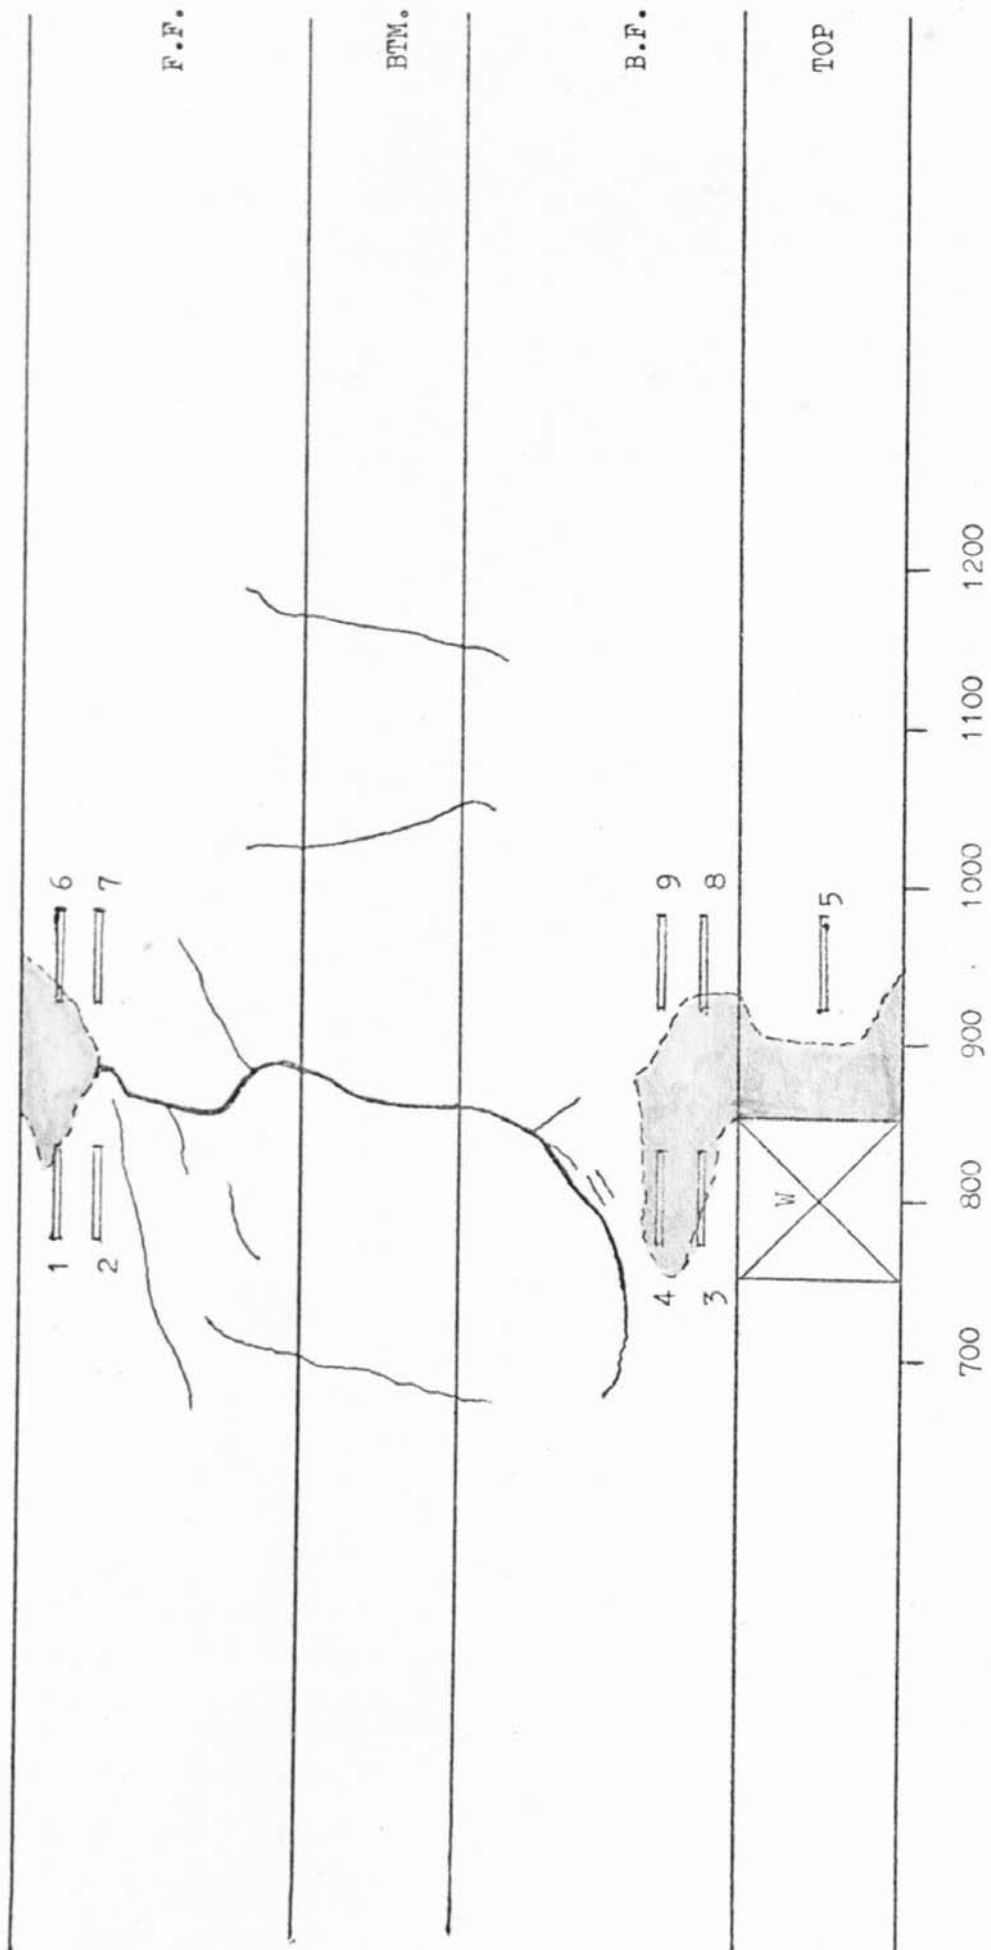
FAILURE CRACK PATTERNS - BEAM 11 (MODE 1)
